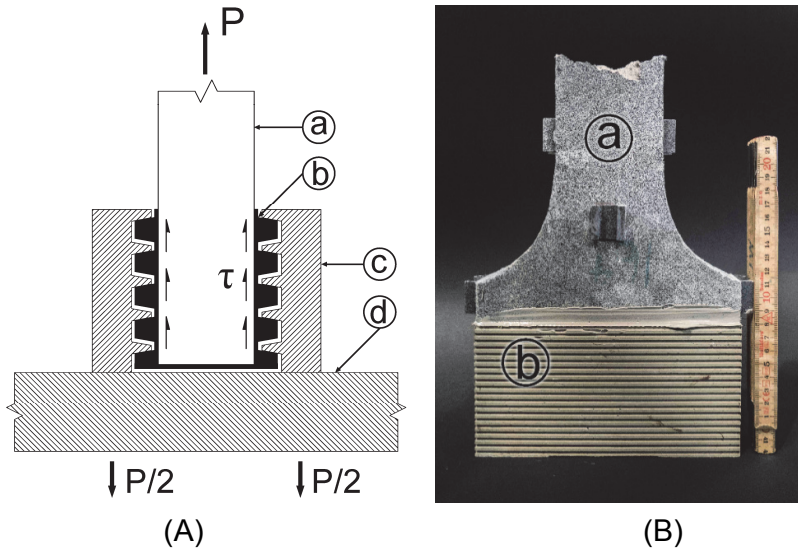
\_ (A) Schematic sketch of the fixture set-up of the uniaxial tensile test (adapted after [50]) and (B) Tensile specimen after testing, with (a) specimen, (b) hardened resin indentations glued to the specimen surface, (c) indented steel plate, and (d) base plate
